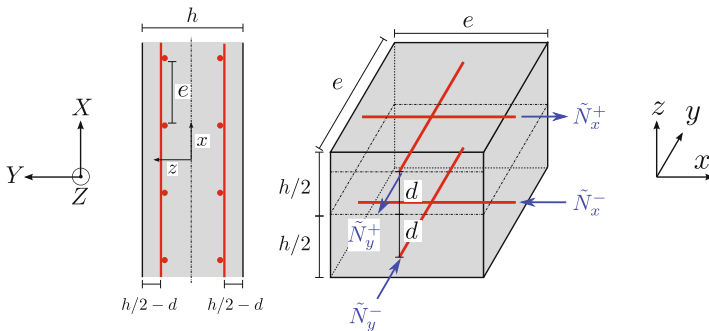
Auxiliary problem used to determine the reinforced concrete panel strength criterion
